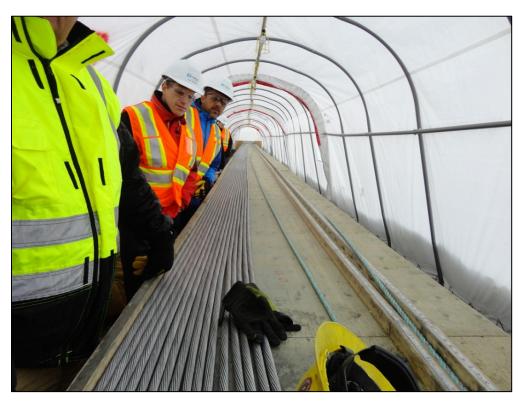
Laydown and preparation of guy cables for HVac transmission towers. (November 25, 2014)
